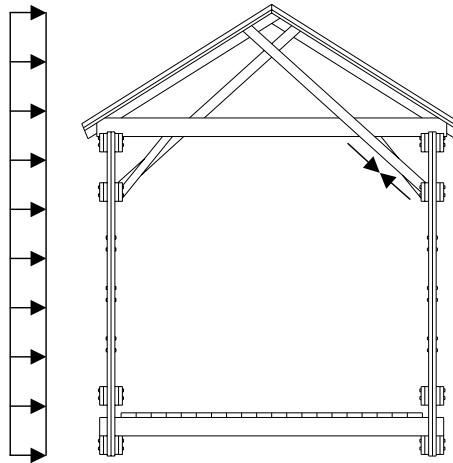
Town lattice truss bridge cross-section showing force in lateral brace
